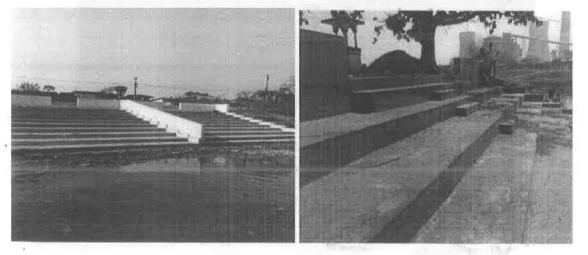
Construction of Stairs near Dadu pond, Patadi Nala, Darri Pond and Nimohi pond at Badadarha, Rampur & Baispali
